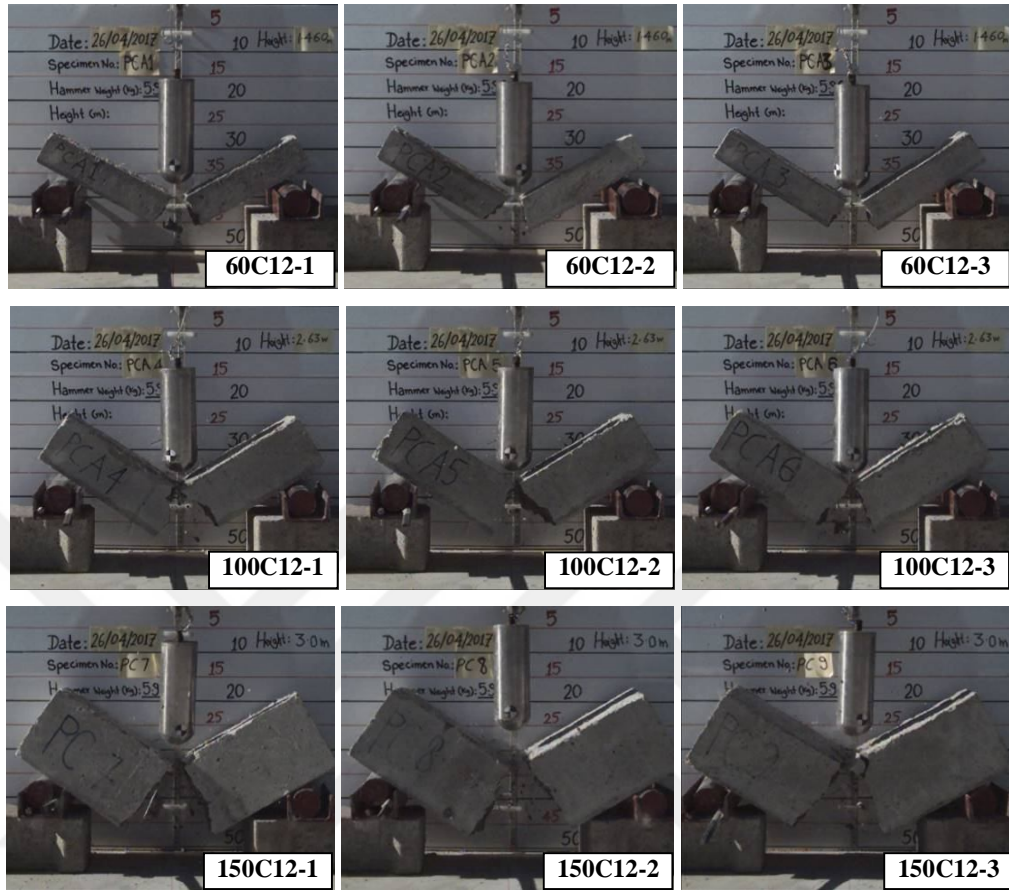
Failure modes of Batch 1 LSC unreinforced specimens (Groups 1, 3, and 5)
